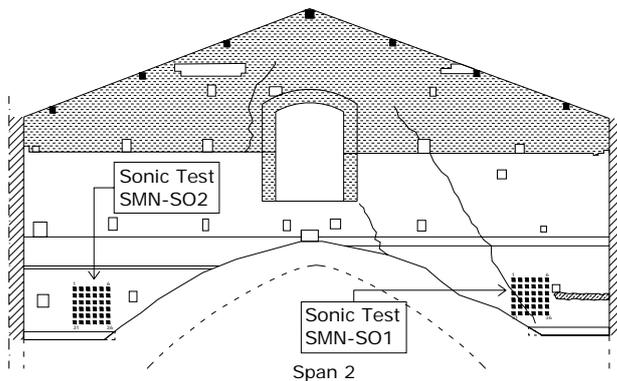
Sonic tests in the transversal wall between span 2 and span 3
